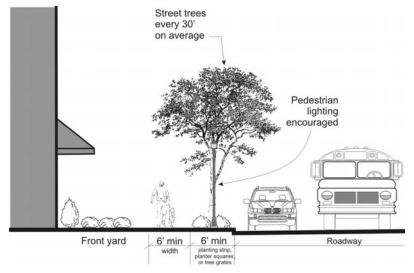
(C)(2)(b). Secondary and Landscaped Street sidewalk/planting strip standards.
